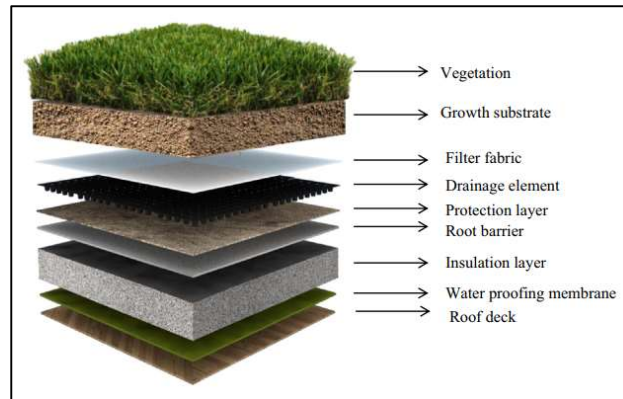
Green roof schematic (Source: Vijayaraghavan et al. 2016)
